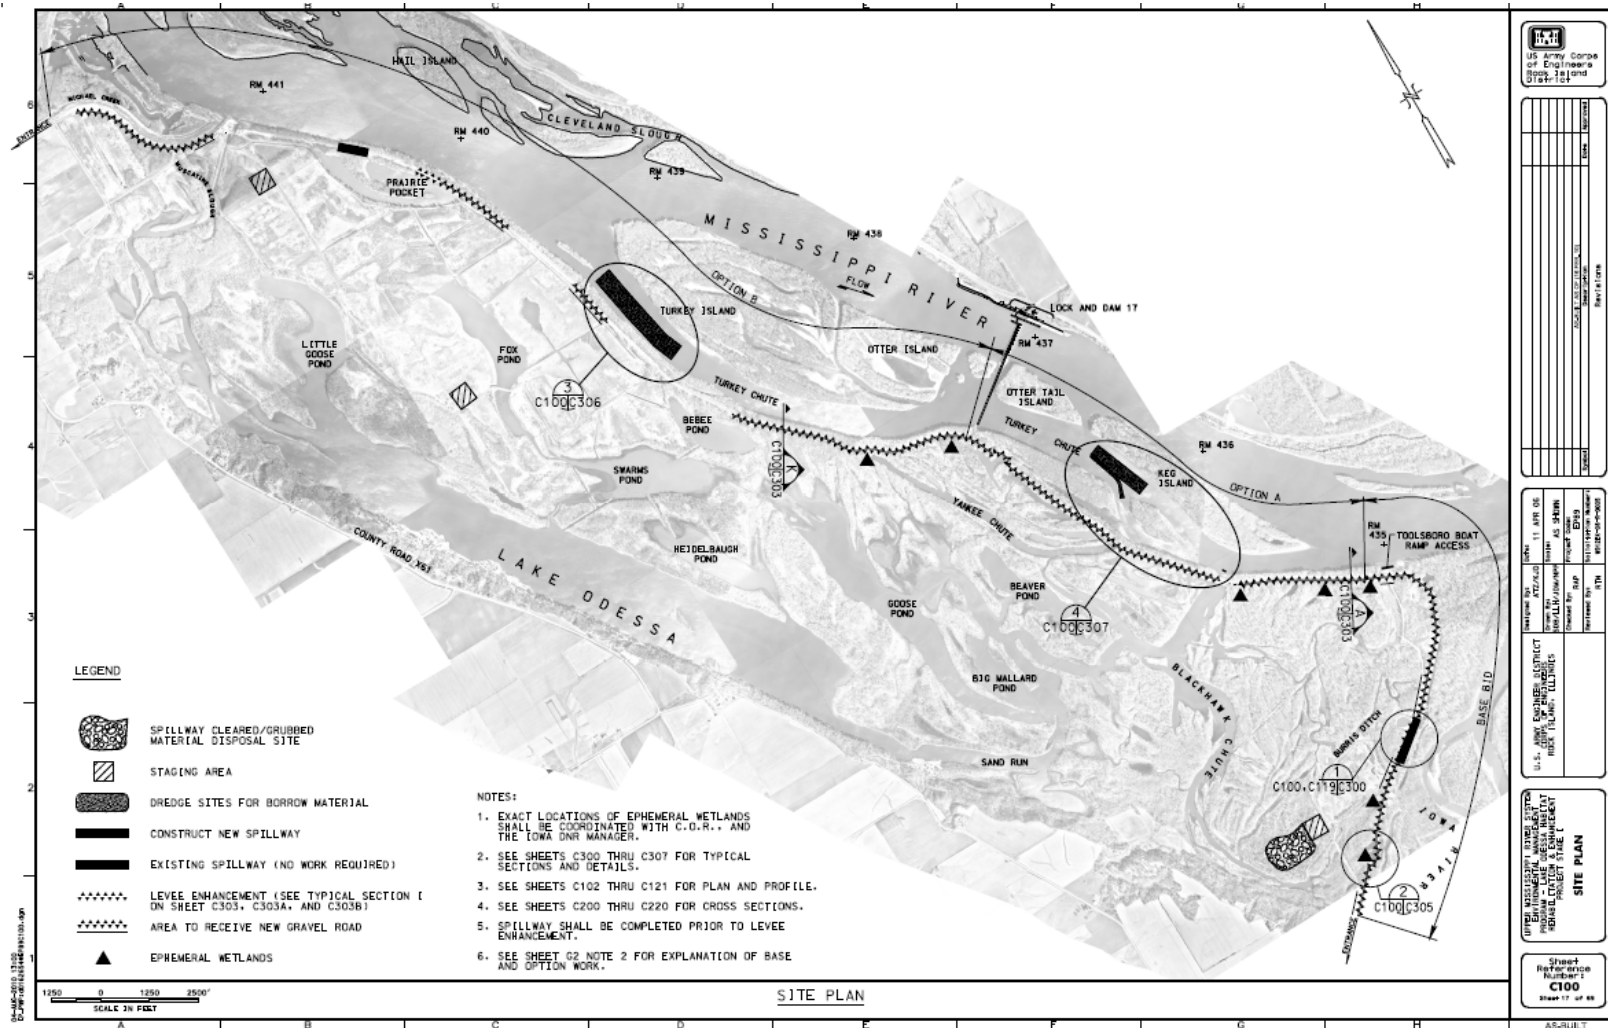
W912EK-06-C-0054 (Stage I) Site Plan
